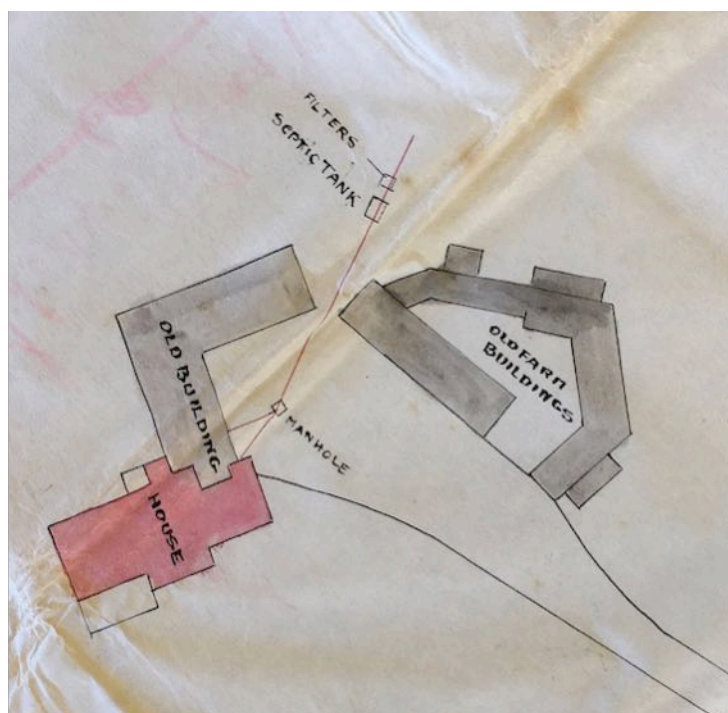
The block plan of Slaters Oak in the 1907 planning application, showing the broadly Z-shaped layout.
